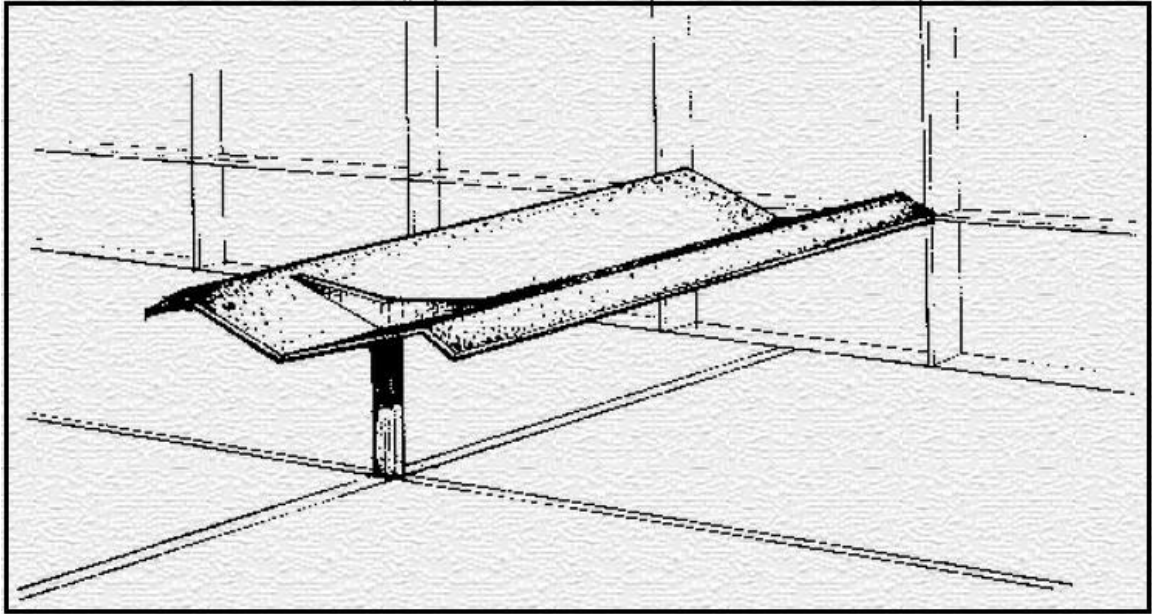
A stiffener element on a folded plate roof. Image courtesy of Mark Ketchum.
